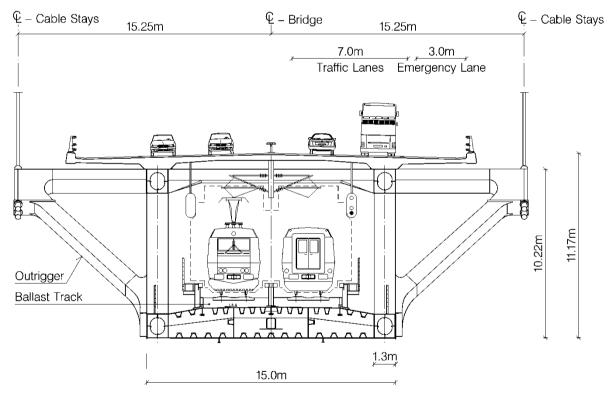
The Øresund High Bridge, cross section, [3]. Dimensions in [m].
